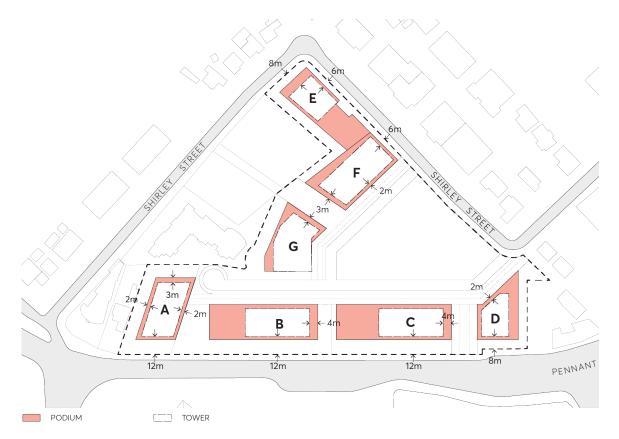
Minimum Required Upper-Level Building Setbacks and Tower Location
